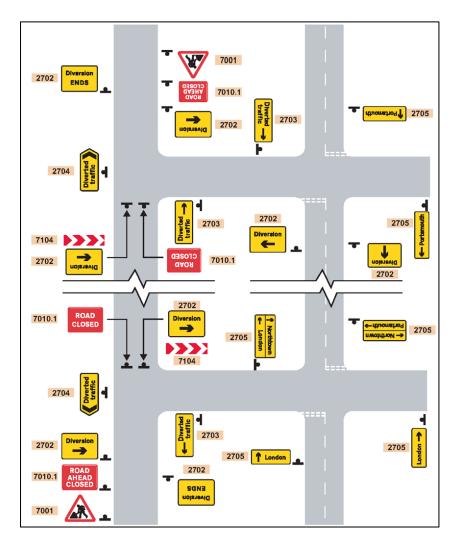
Layout of Signs for Road Works on Single Carriageway Roads with Diversions
